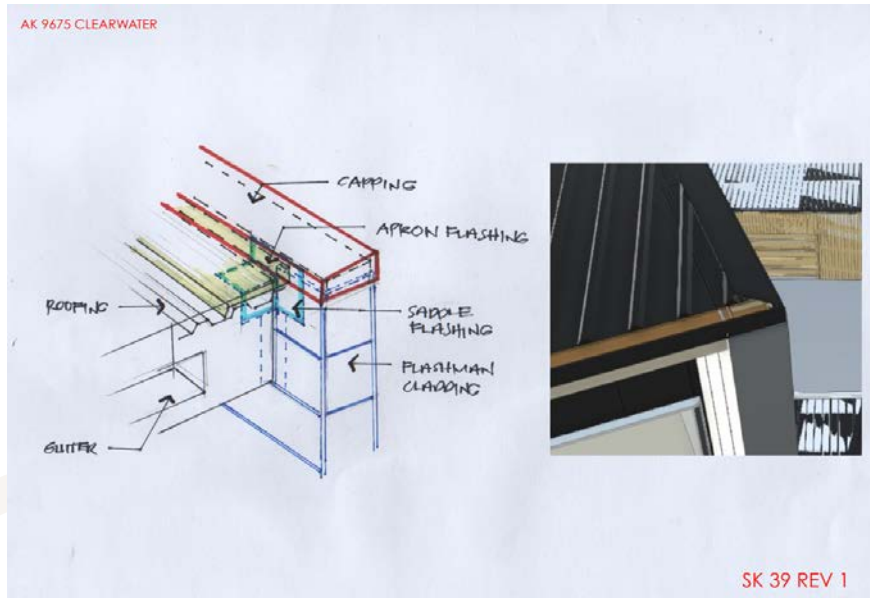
Inhabit Sketch 39 – Roof to Cladding Interface
